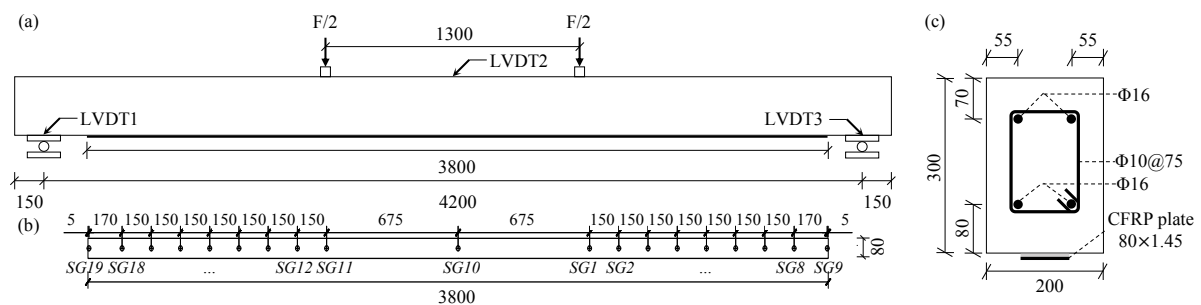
(a) Test set-up for specimens in experimental programme A, subjected to four-point bending; (b) bottom view of the self-anchored prestressed CFRP plate on specimen B3 with 19 strain gauges installed along its length; (c) cross-sectional dimensions of the RC beams with bonded CFRP plate (applied to B2 and B3 only).
